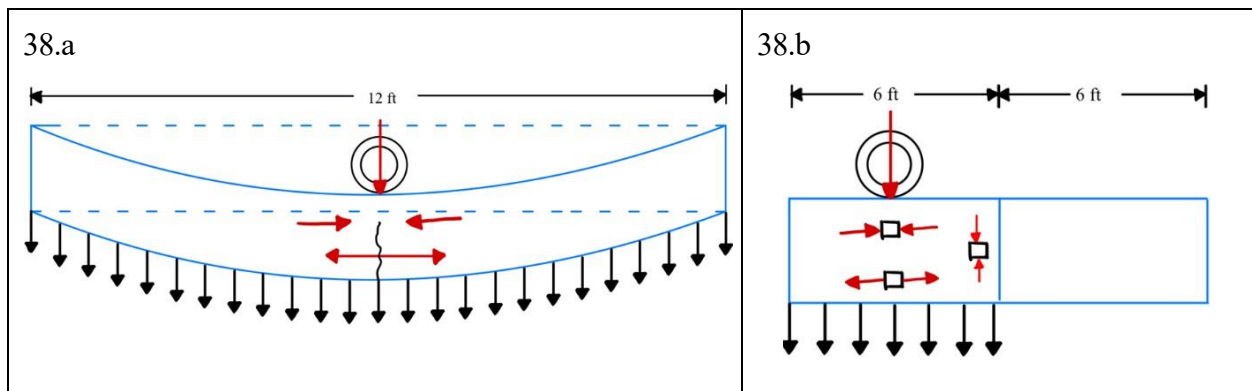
Wheel Load bending at the intersection on 12ft slab size and 24b. Wheel load bending at the intersection of 6ft slab size
